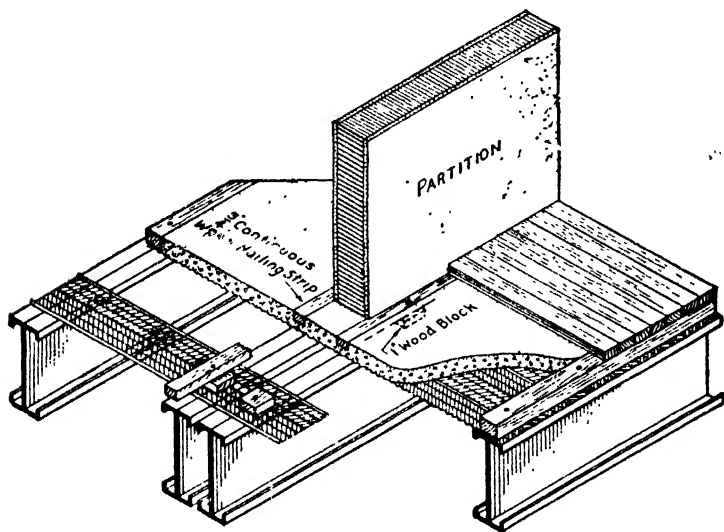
,480.—Berloy metal lumber. Floor and partition construction showing double joists on the partition and method of nailing wood floors.
